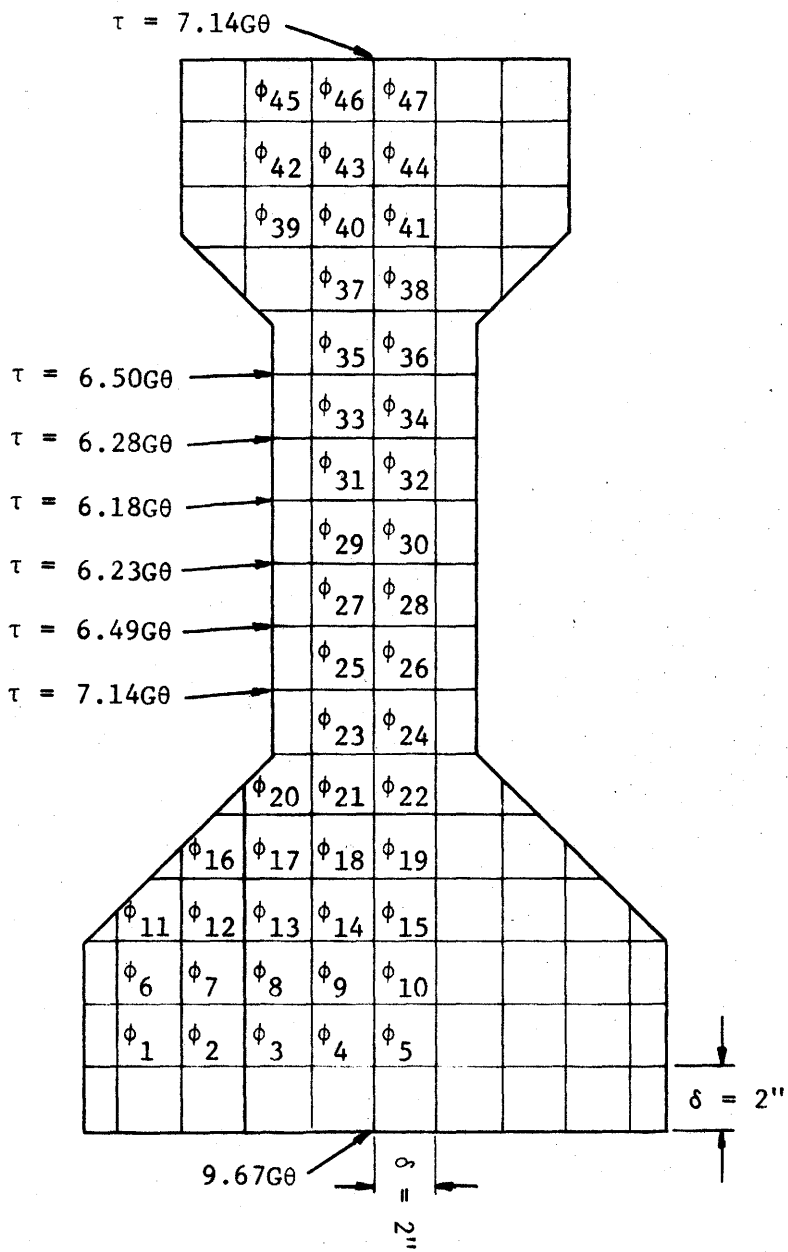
Cross section of THD type B prestressed girder showing grid system and values of shear stress.
